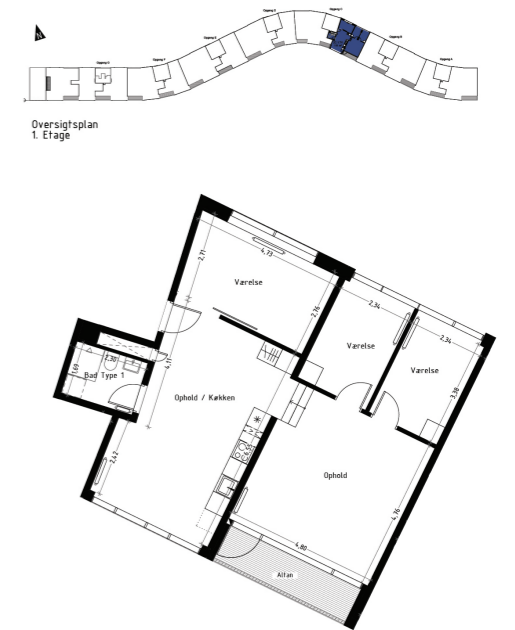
, Floor Plan of Dortheavej 2C 1. tv., 2400 København NV
